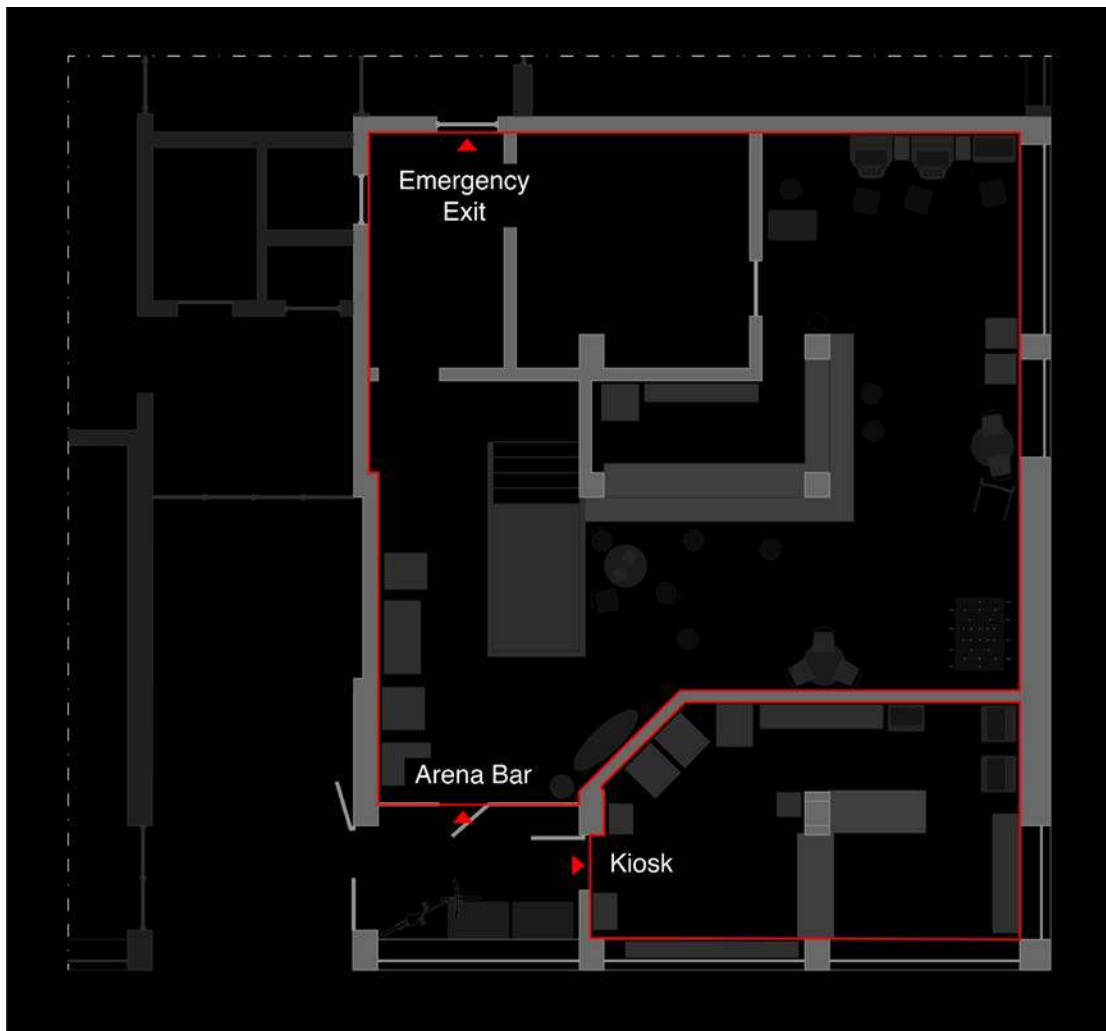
Digitised drawing of Arena Bar and Kiosk, within a floor plan of the larger building.
